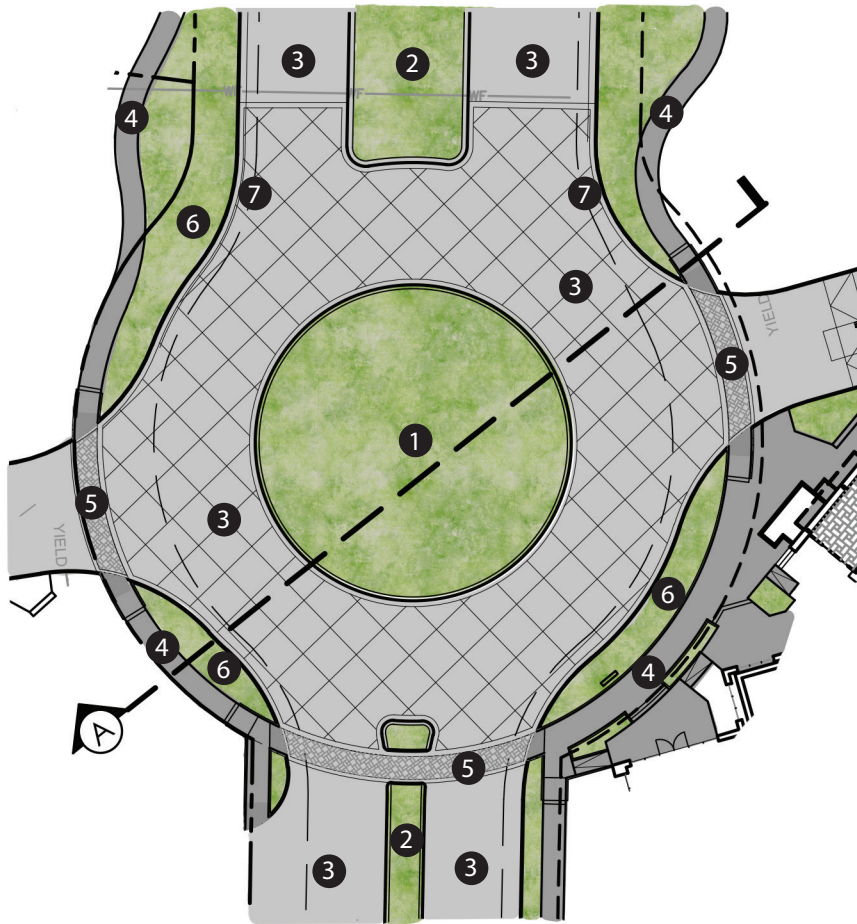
Internal Connector Road at Secondary Entry Corner
